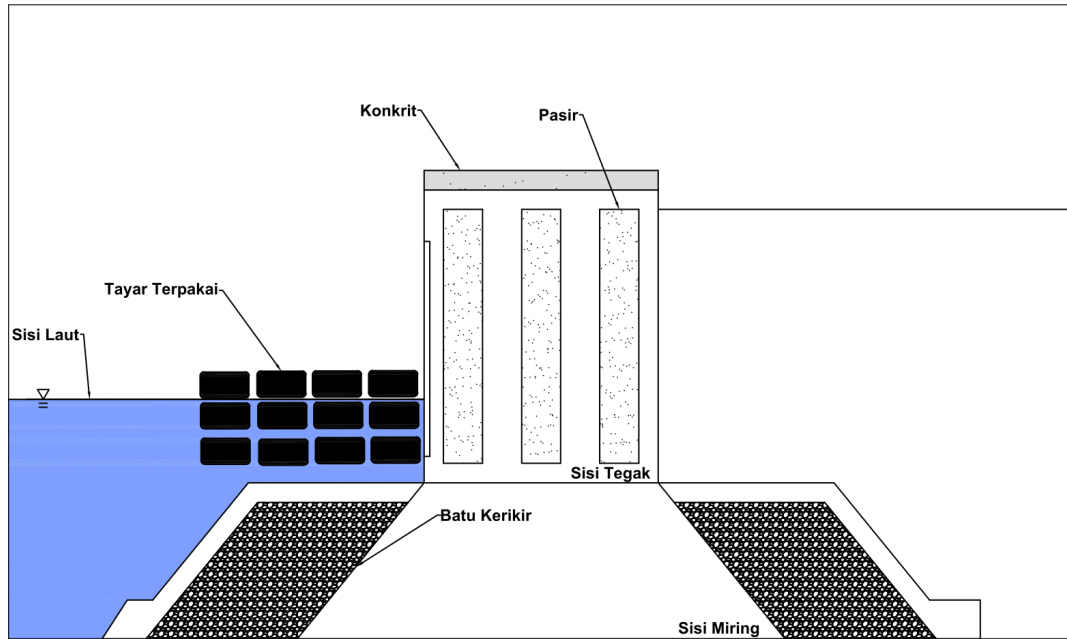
Proposed breakwater structure when the water level is at its lowest level
